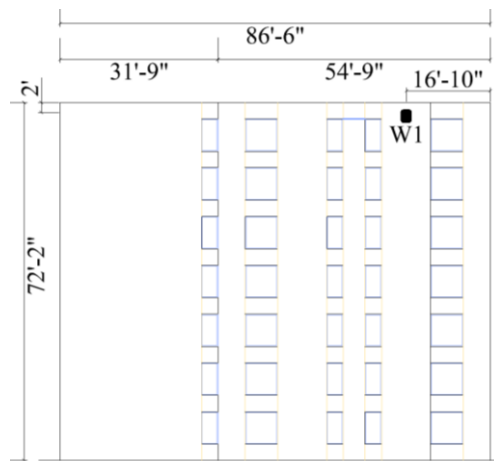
North-west elevation of McLeod House with driving rain gauge locations
